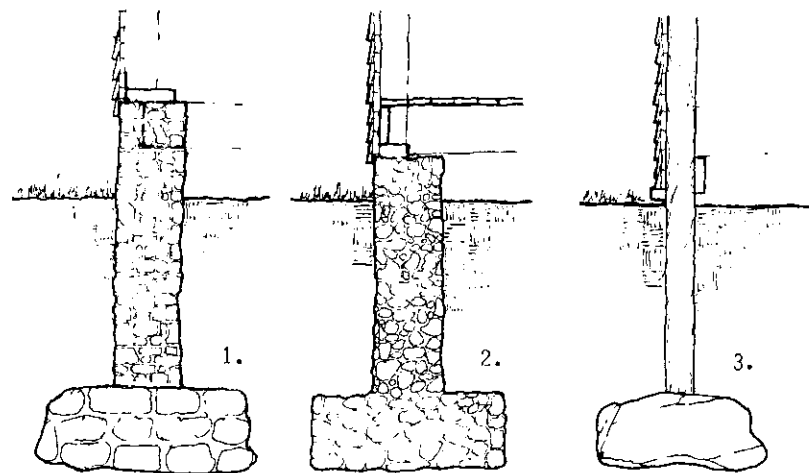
Foundations: Coursed Rubblestone (1); Uncoursed Rubblestone (2); and Timber Post & Stone Footing (3)
